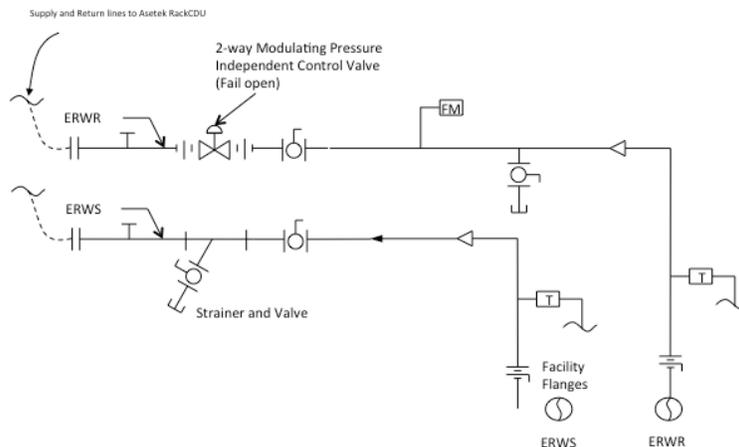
Line drawing of facility pipe additions to support Asetek RackCDU.
